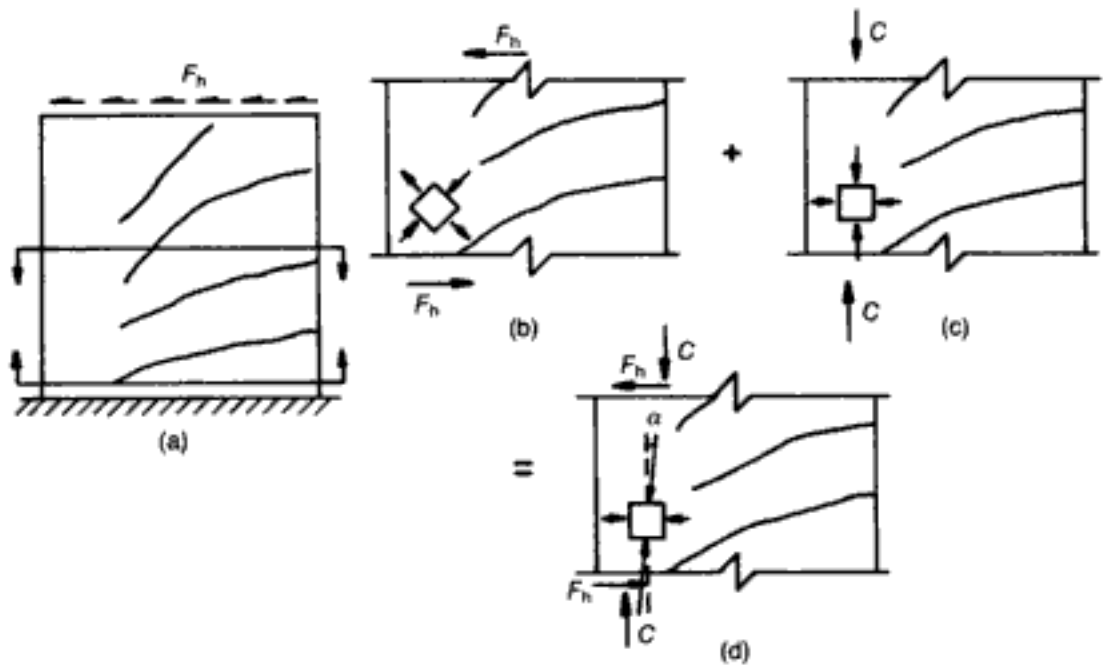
Schematic representation of the failure mechanism in a structural wall.¹²⁸ (a) typical wall at incipient failure; (b) effect of shear force F_h leading to tensile stresses; (c) effect of large compressive force C giving rise to volumetric expansion and hence multiaxial stresses; (d) combined effect of (b) and (c) producing a state of multiaxial compression countering the local tensile stresses due to shear, and leading to an inclined compressive-force resultant sufficiently large to equilibrate the horizontal shear force
